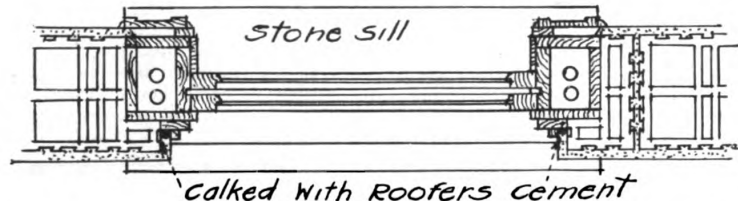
Plan of Hollow Tile Wall With Window Frame and Sash in Place
